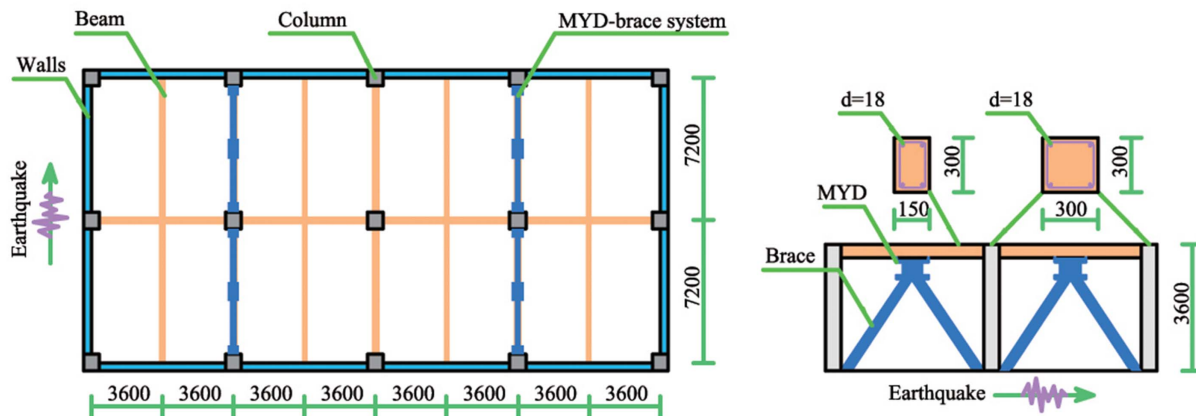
Plan and elevation of the RC structure with MYDs (unit: mm).
